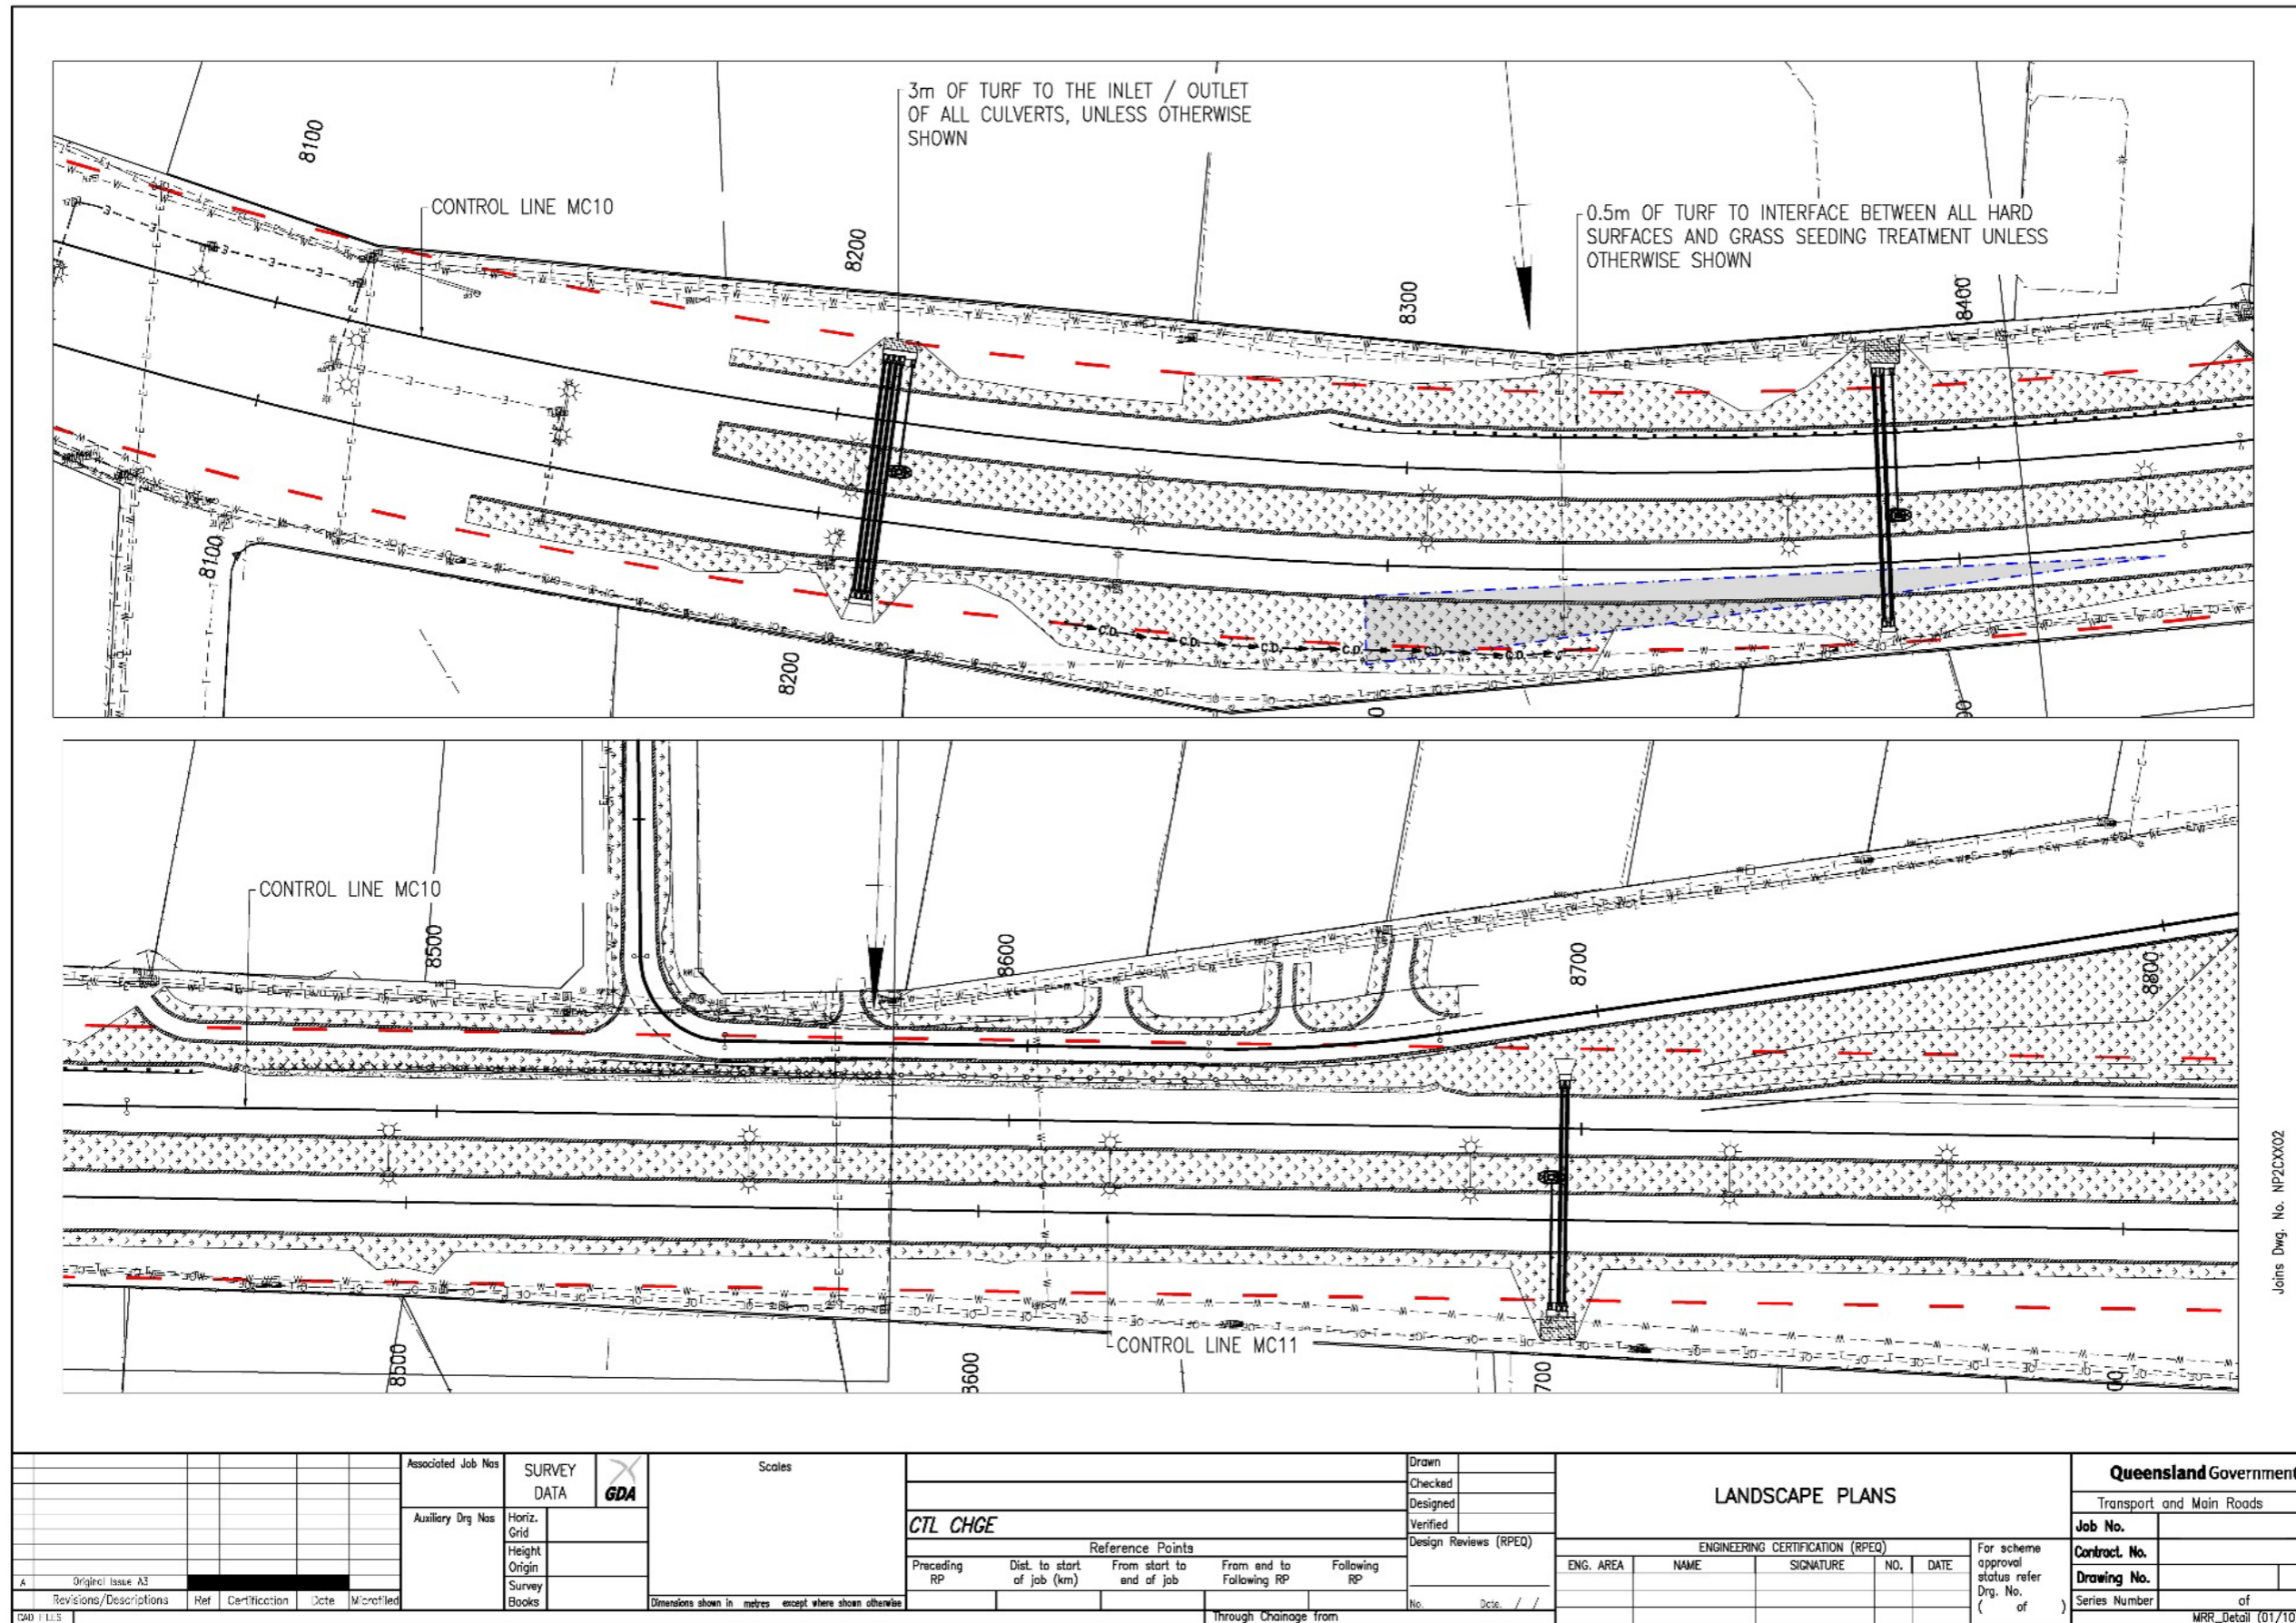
(c) – Landscaping details and layouts – generic example 2 – sheet 2 of 4
